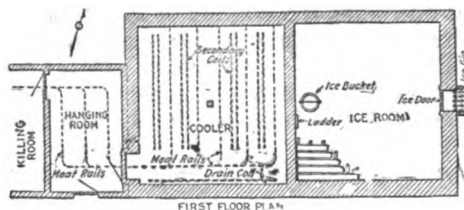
First floor plan of the cold storage building shown in the two preceding figures
